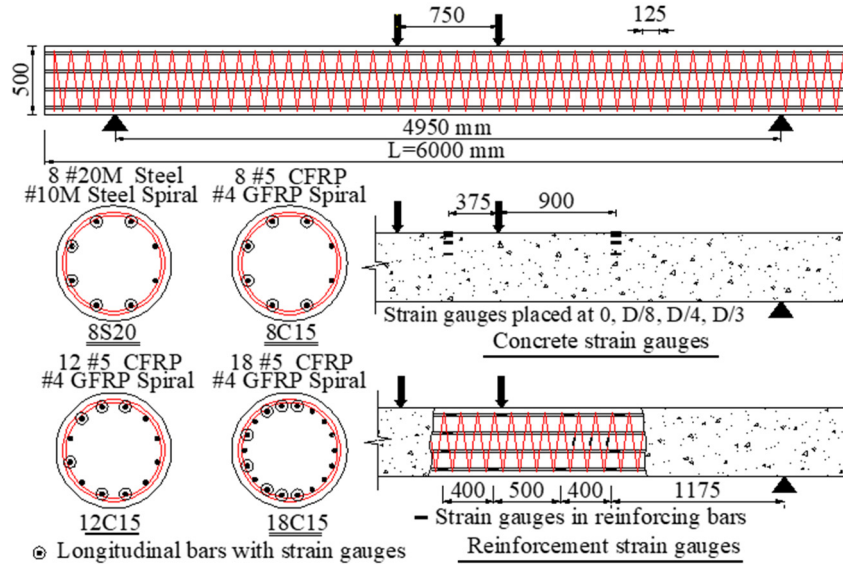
Dimensions, reinforcement details, and strain-gauge locations of the test specimens (dimensions in mm).
